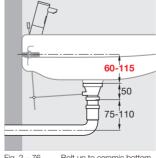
76 Bolt up to ceramic bottom edge 60–115
